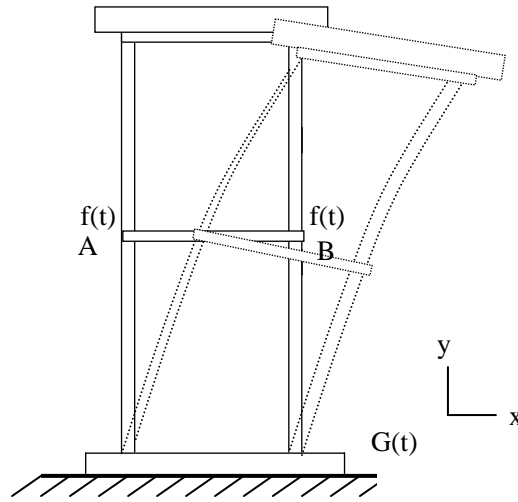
Rectangular steel frame, main structure, and local beam AB
